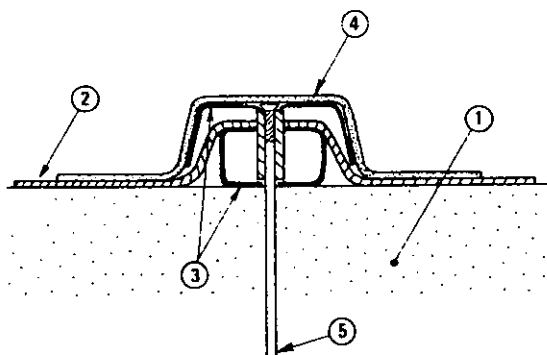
Configuration of vertical anchorage and tensioning system as reported in ICOLD Bulletin 78
